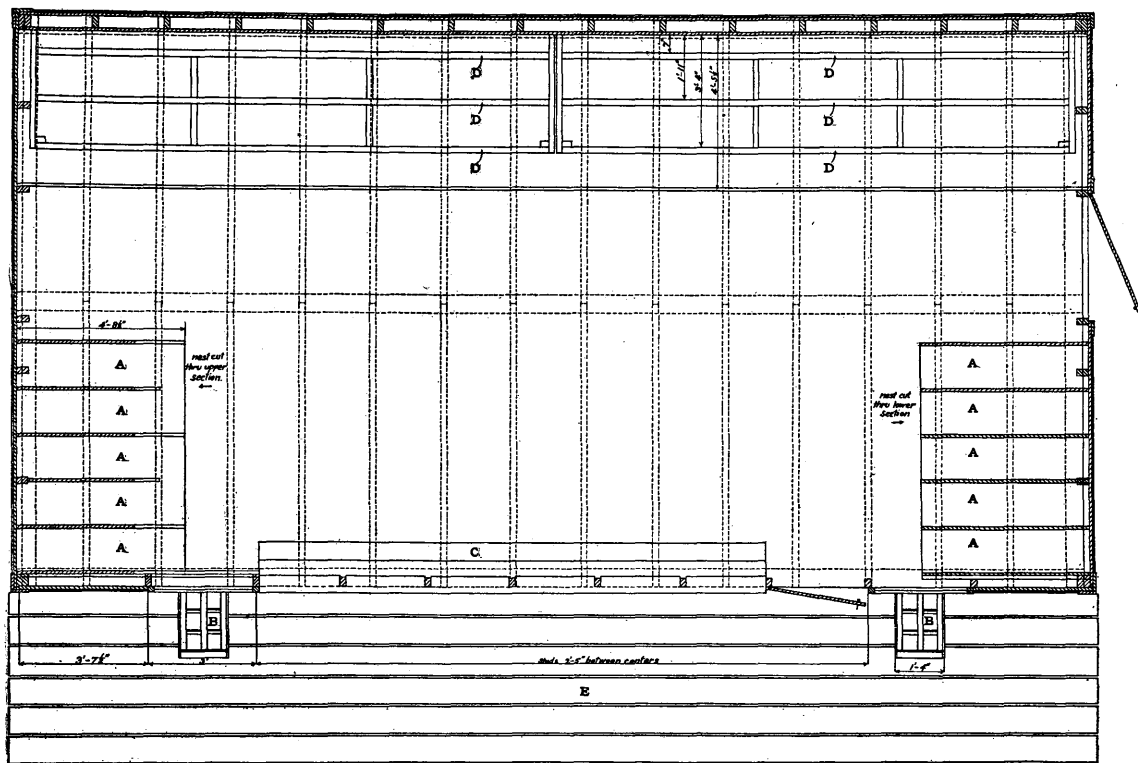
Floor plan of one unit of No. 3 curtain front poultry house. In this and the following four figures the significance of the letters is as follows: A.—trap nests. B.—runways to yards. C.—dry mash trough. D.—roosts. E.—walk. F.—front opening. G.—coop for broody hen. H.—spike to hang green food on. I.—grit trough. J.—curtain front.
